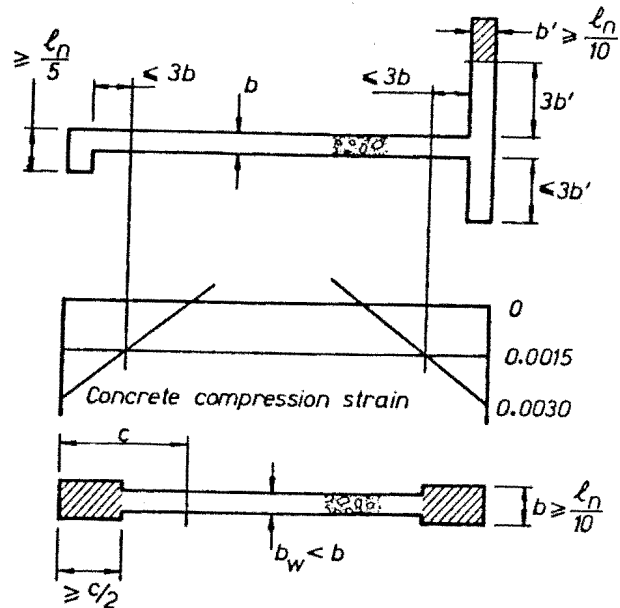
Parts of a Wall Section to be Considered for Instability.
